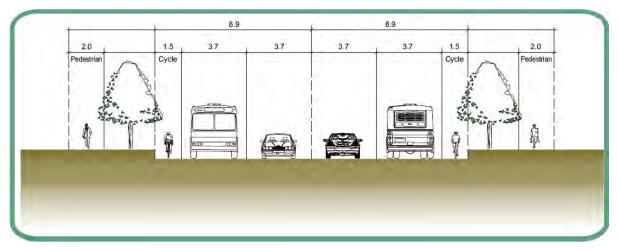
Highway 4 – Example of a Typical Cross-Section
